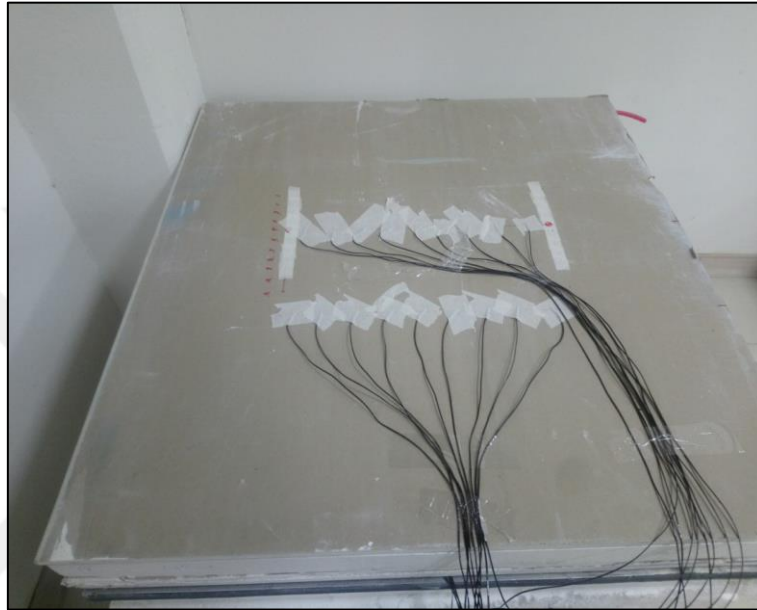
Thermocouples placed on the hybrid wall specimen.
